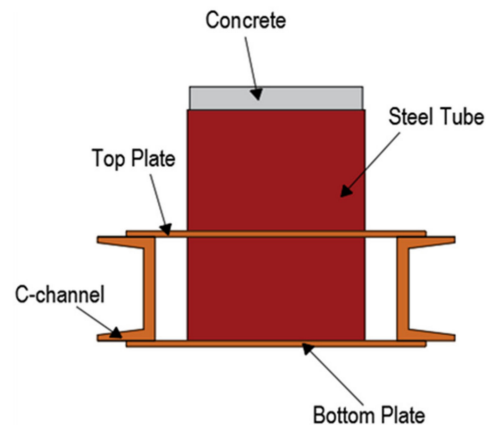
CFST column—details of column-to-foundation beam connection [7].
